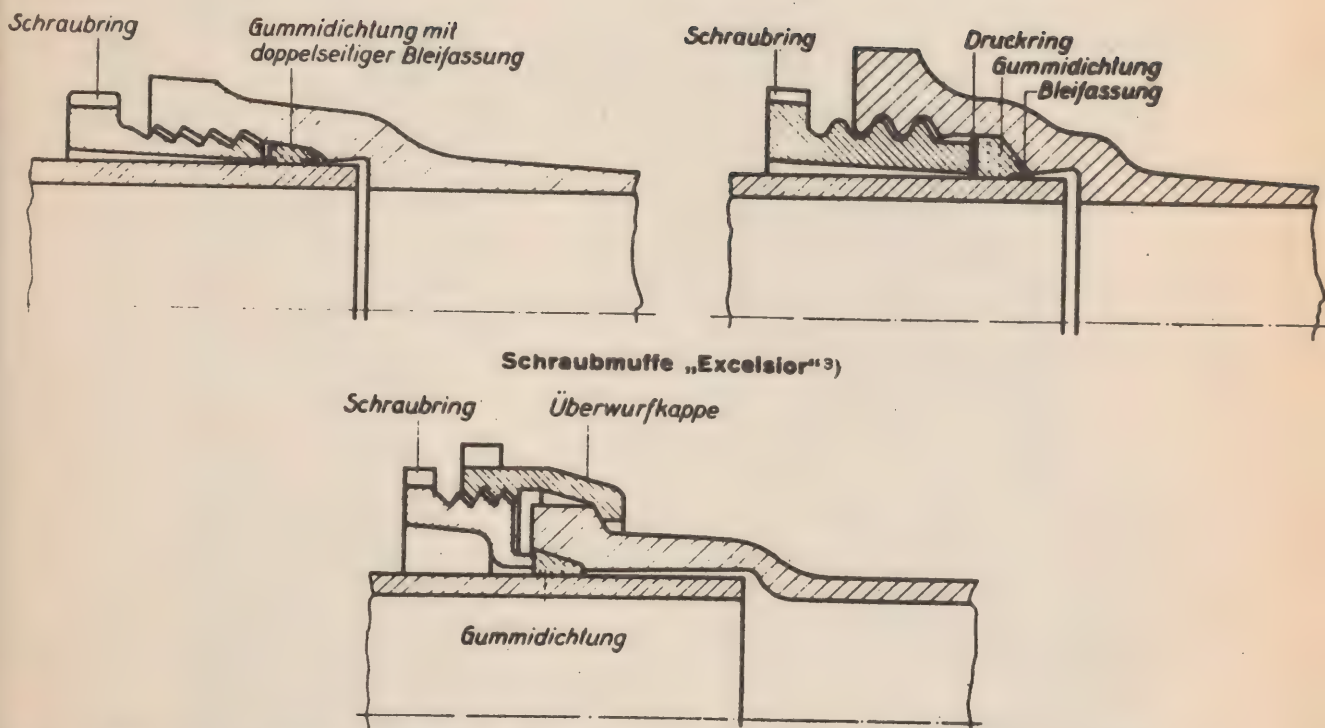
c, types of cast iron pipe joints in Germany using threaded nipple insert.
